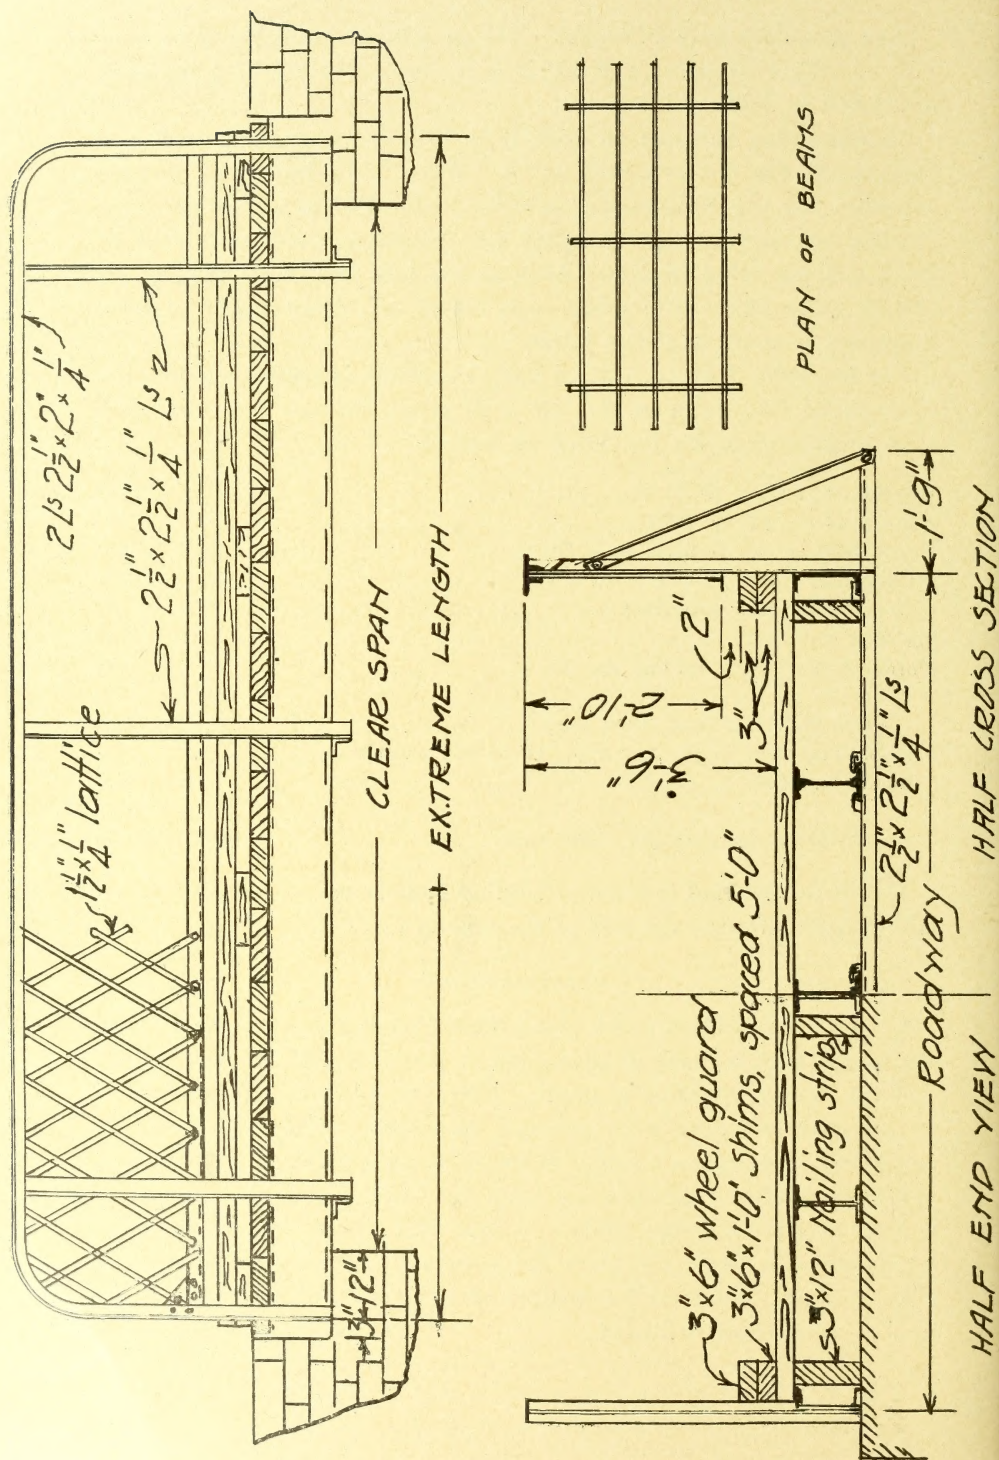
Steel I-Beam bridges. (American Bridge Co.)
